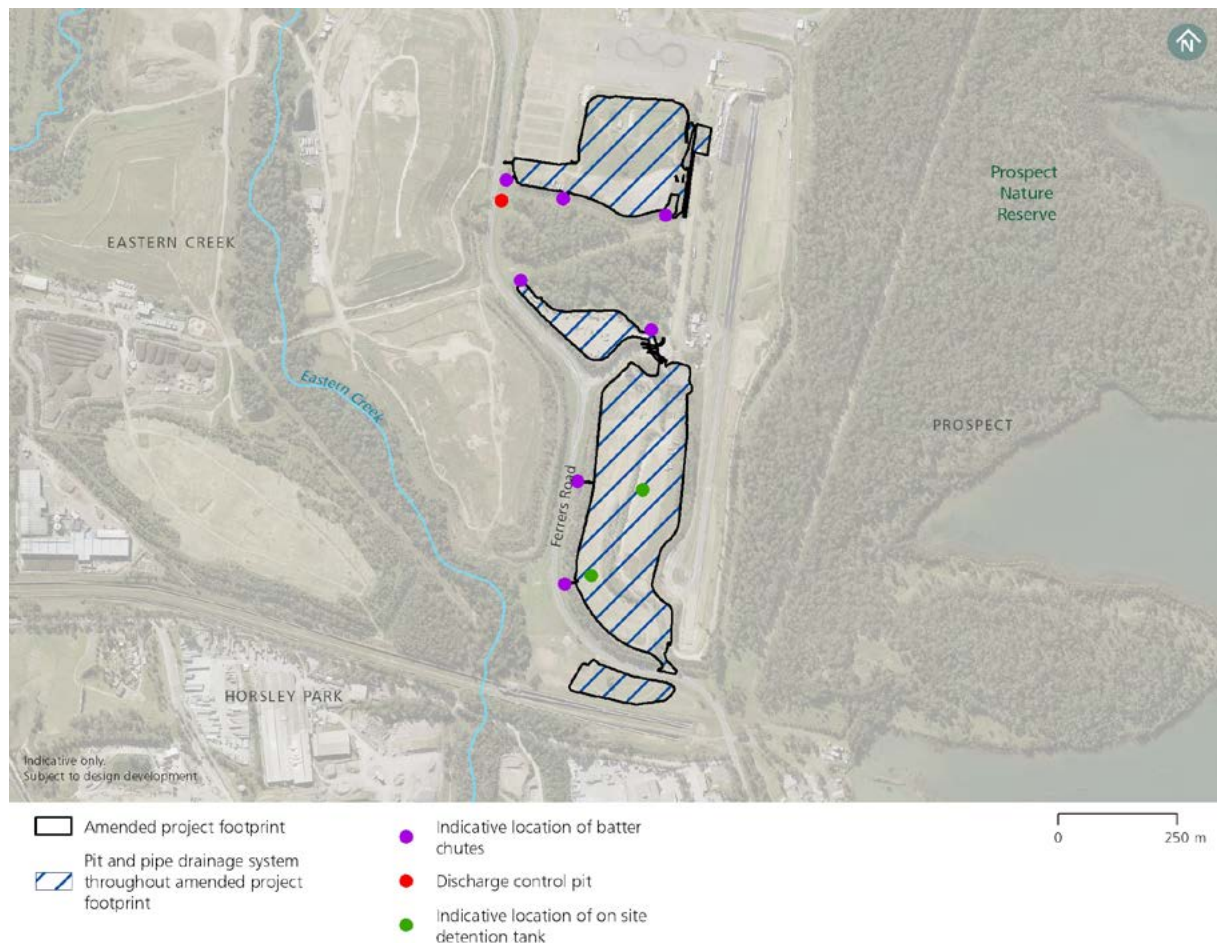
Indicative layout of the revised stormwater and drainage infrastructure
